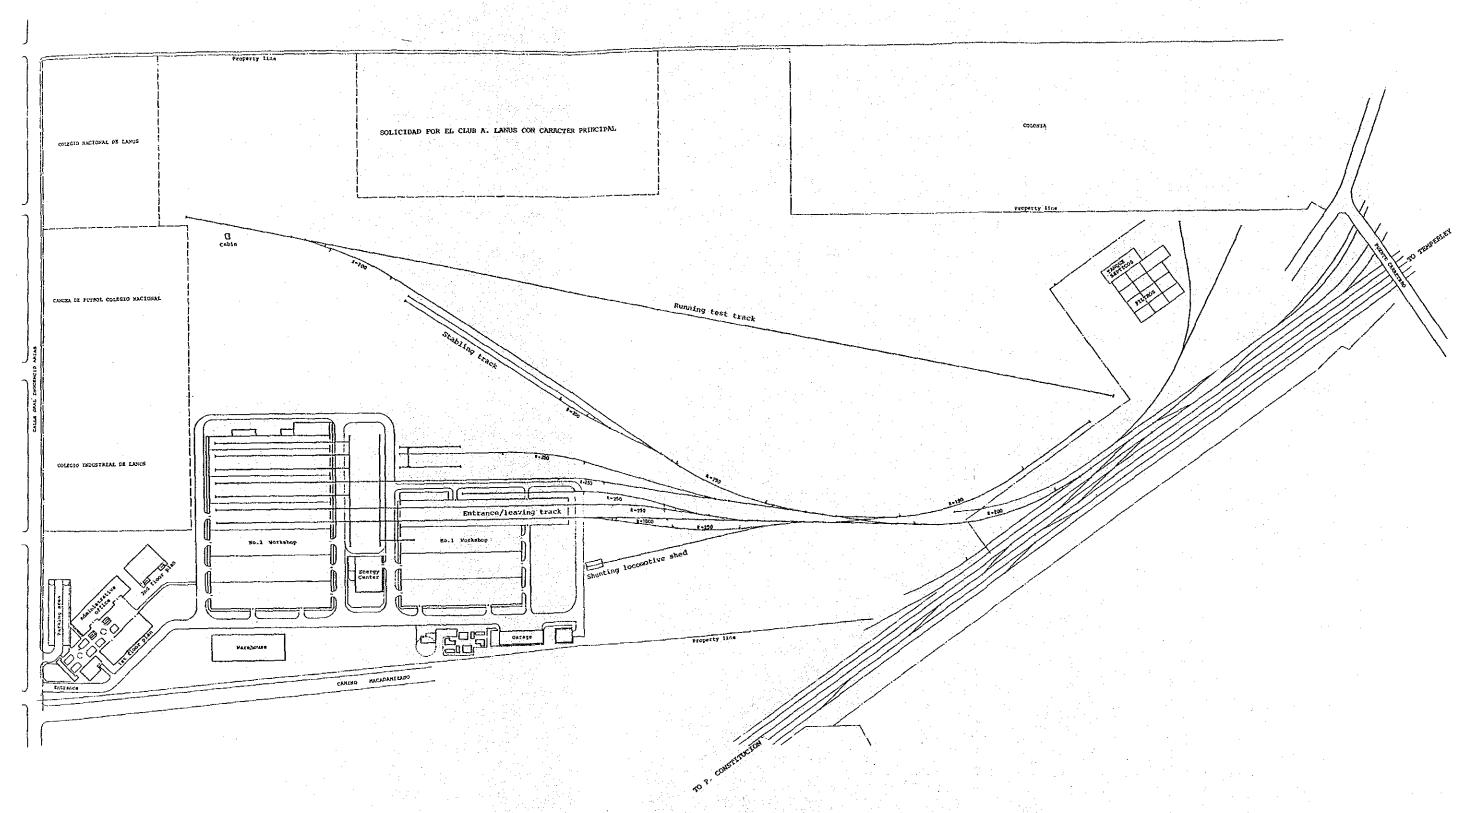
Layout of KM 10 Workshop Proposal Ib, II
